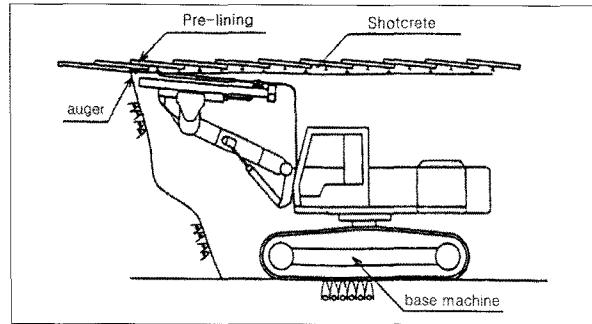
Excavation method of the slit concrete pre-lining using auger
